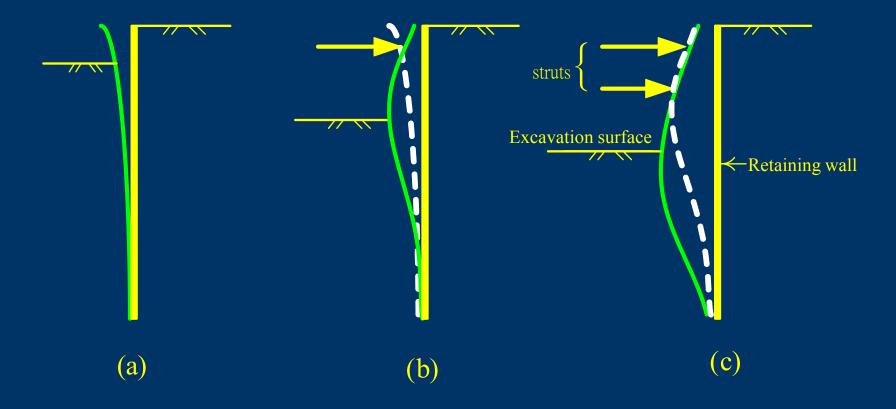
Relation between the shape of wall deformation and high strut stiffness (a) first stage of excavation (b) second stage of excavation
